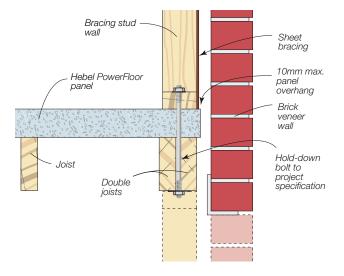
Hold-down of Internal Bracing Wall Parallel to Joists
